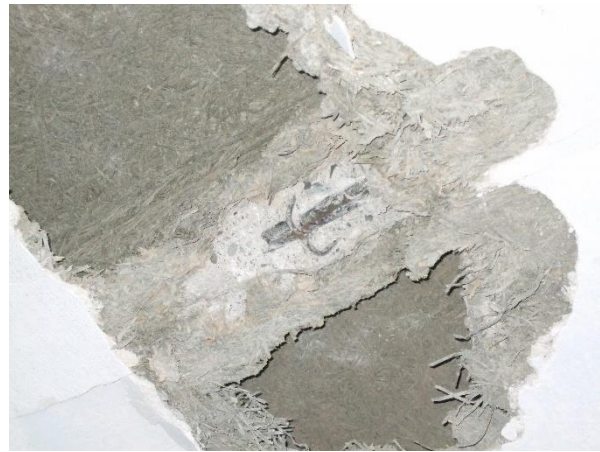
Area “1” Bottom view of hollow block floor on the ground floor
